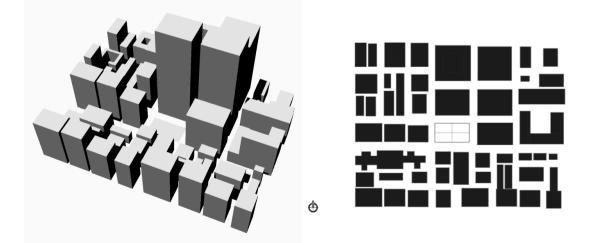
Site plan (right) and Aerial Perspective for a residential tower.
